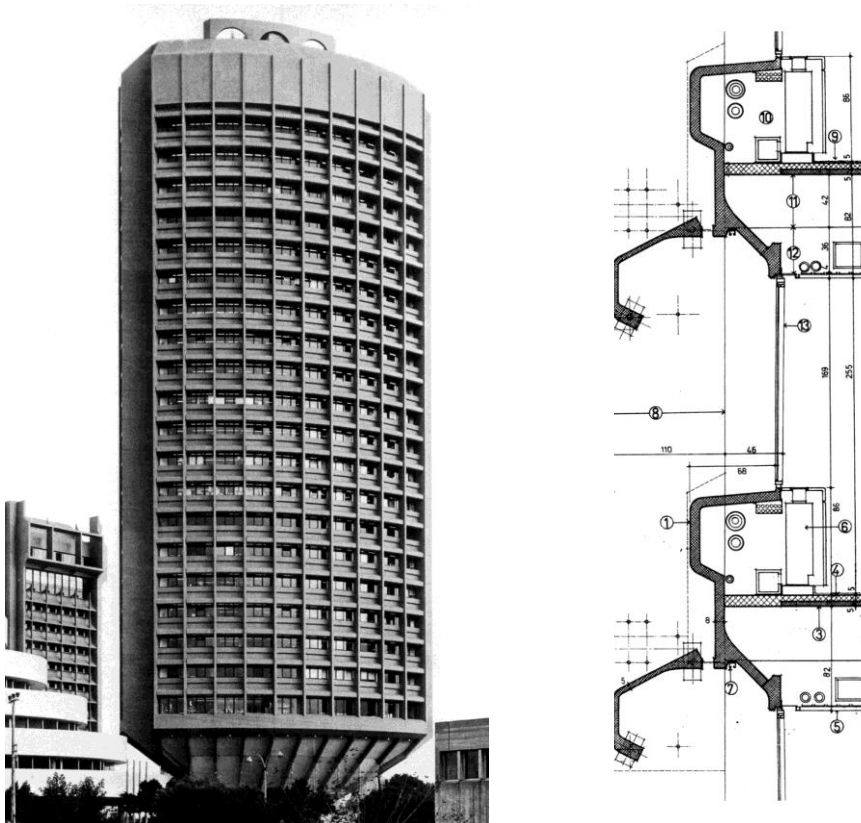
Yasky-Gil-Sivan, IBM Building, Tel Aviv, 1978, western facade (left, photograph by Ran Erde) and a typical facade cross section showing a precast sun breaker designed for the project (right, indicated by the number 2). In the back of the photograph appear two other office buildings from the same era (Asia House and America House) which employed a similar shading strategy of deep and solid overhangs (Rotbard 2007, 826, 829)
